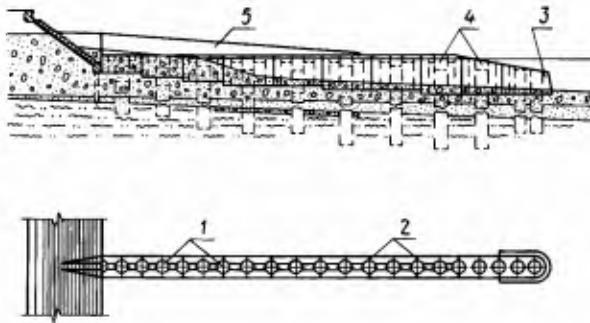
Scheme of the concrete block groin set on cylindrical hollow pile foundation.
